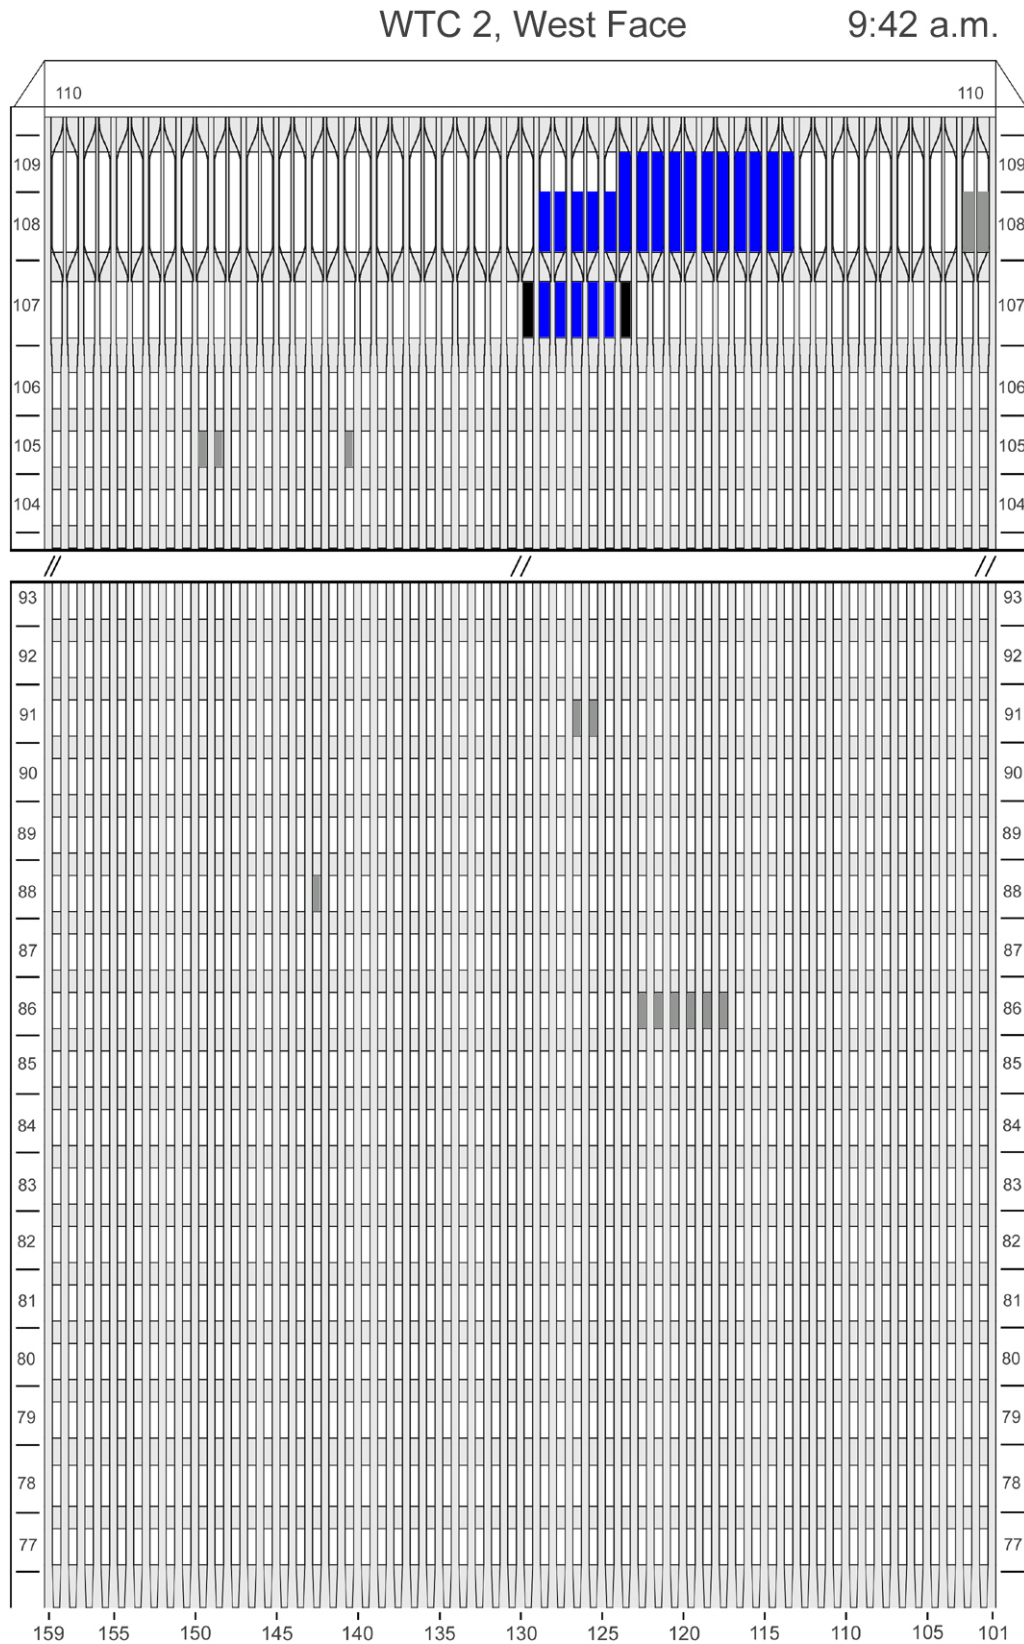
Diagram of the west face of WTC 2 for floors 77 to 93 and floors 104 to 110 at 9:42 a.m. showing windows where smoke was observed and those hidden from view.
